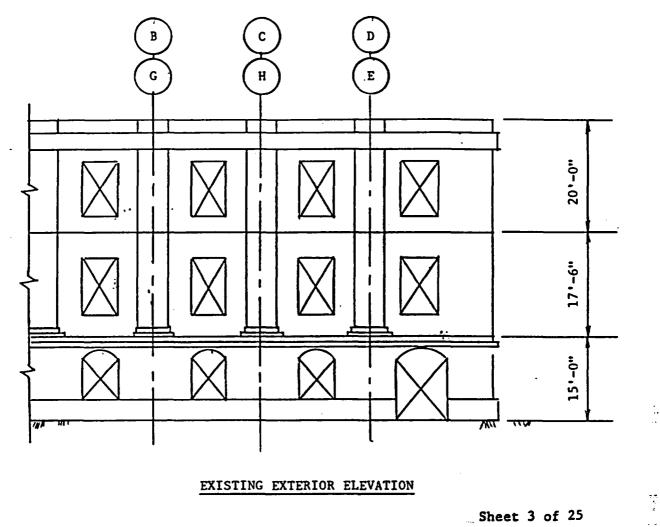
Brick building with concrete framing system. (Sheet 1 of 25)
